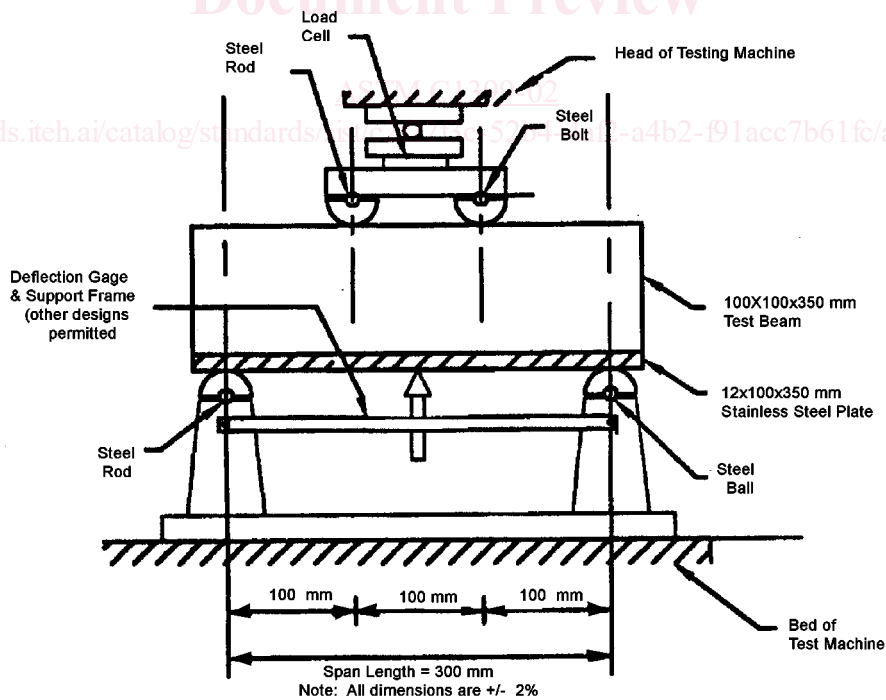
Schematic of a Suitable Apparatus Where the Deflection Gage Support Frame is Clamped to the Beam Supports
